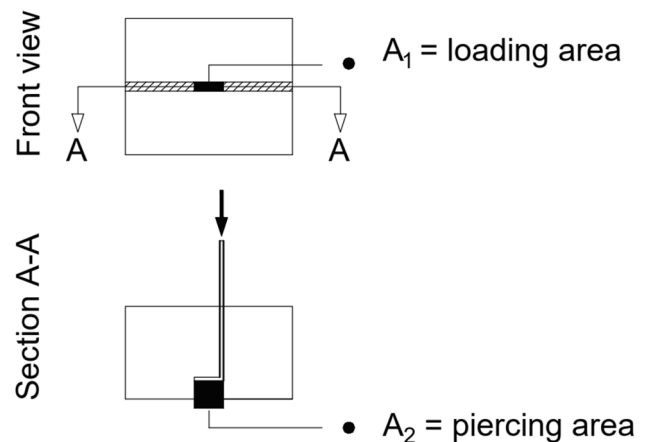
The failure area of Piercing: front view (top) and mortar joint section (bottom).
